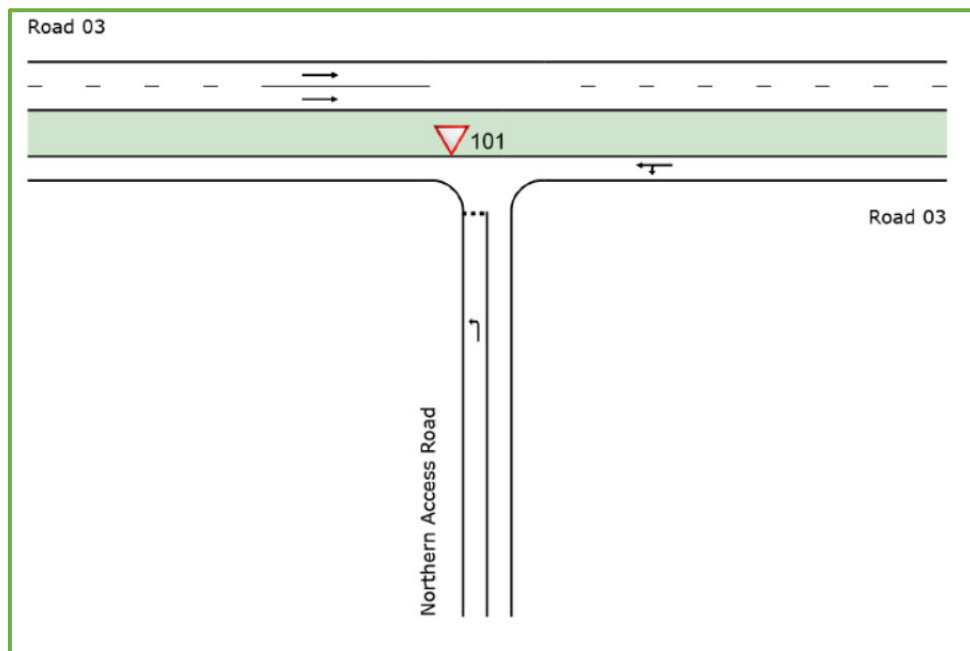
Amended Northern Access Road / Road 03 Intersection Layout
